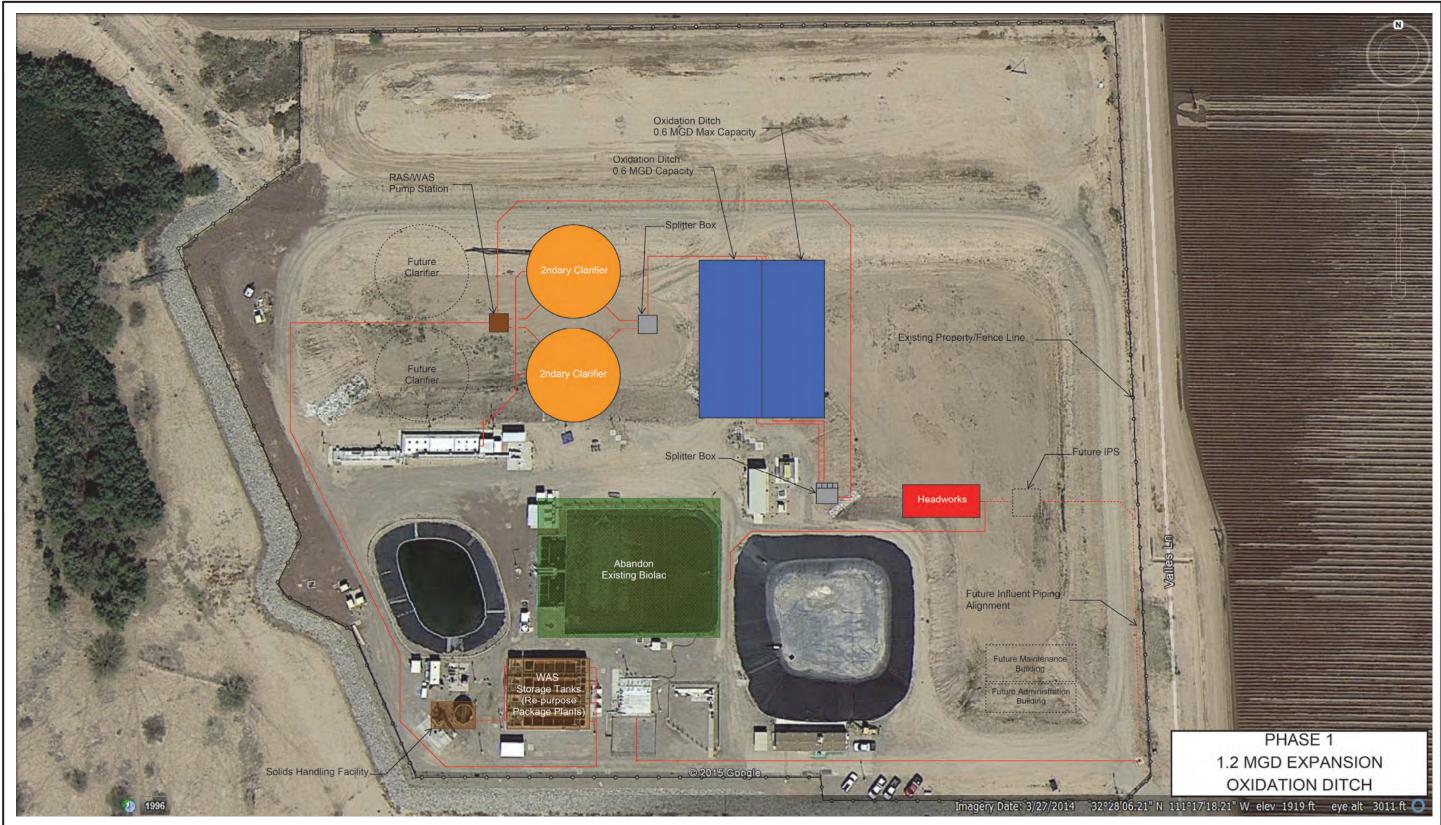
shows the Phase 1 BNR-OD process alternative site plan, with the BNR-OD new facilities located north of the existing facilities and assuming refurbishing the existing Biolac[®] system. Figure 4.12 shows the site footprint of a 1.2 mgd BNR-OD. Figure 4.13 presents the general process flow diagram of the Phase 1 BNR-OD alternative.
